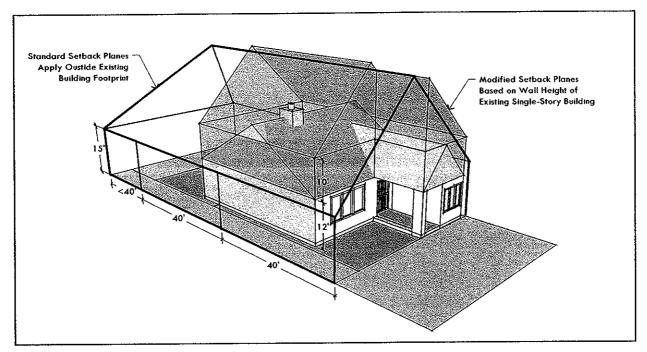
Side Setback Plane Exception for Existing Single-Story Buildings
